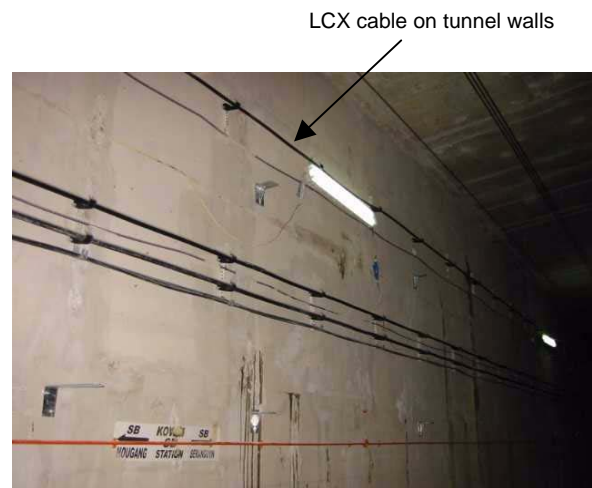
LCX cables on the tunnel wall of North-South East-West MRT Lines
